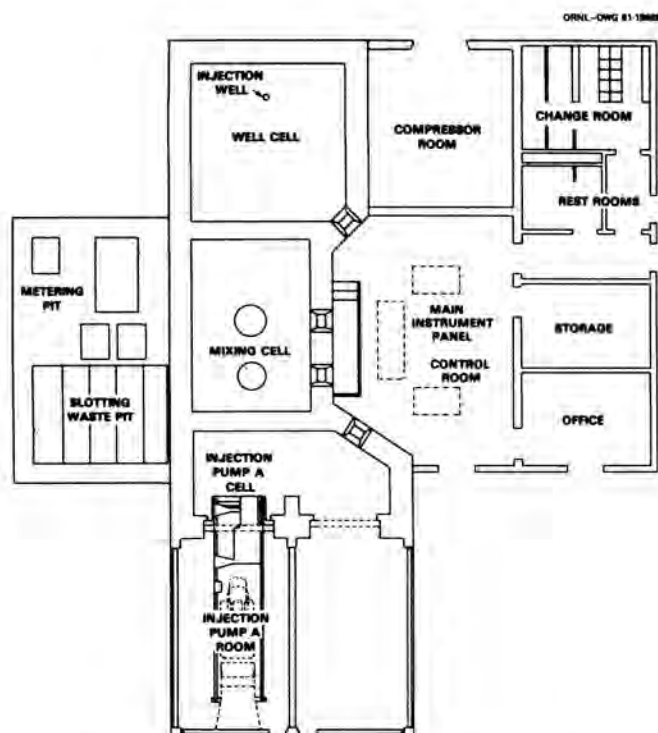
New Hydrofracture Facility Floor Plan.
